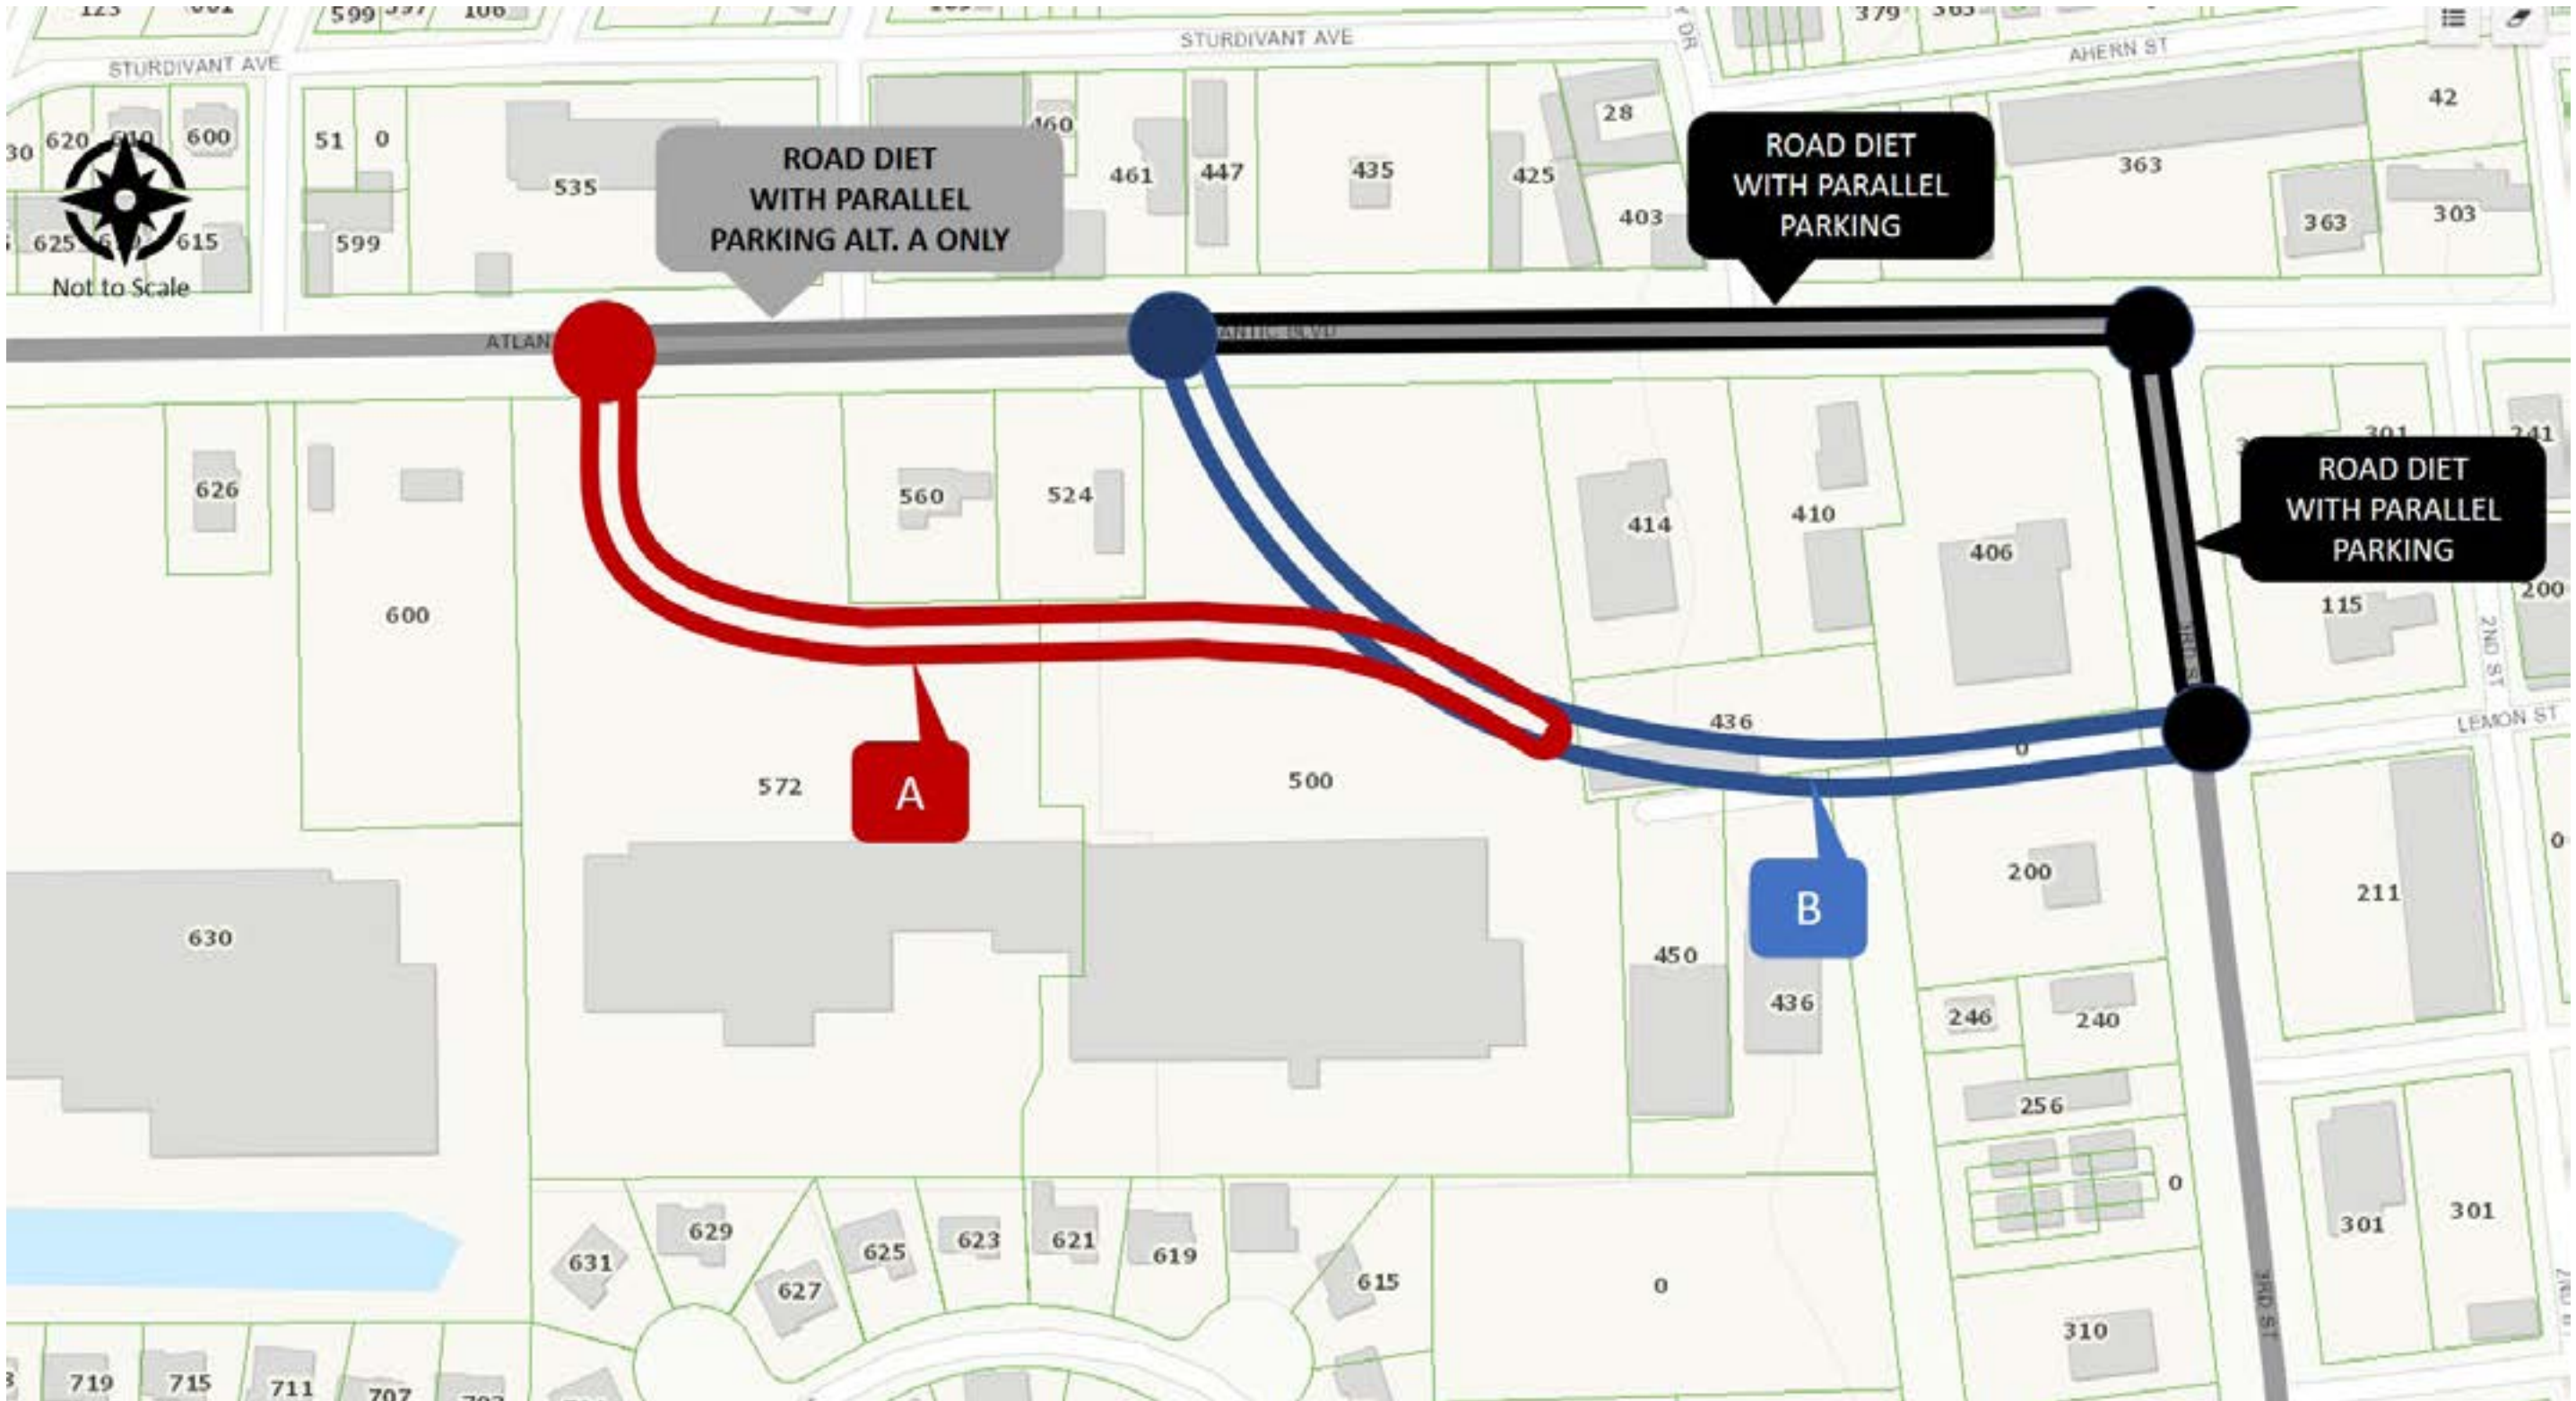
Extension of Lemon Street (Neptune Beach Vision Plan)
